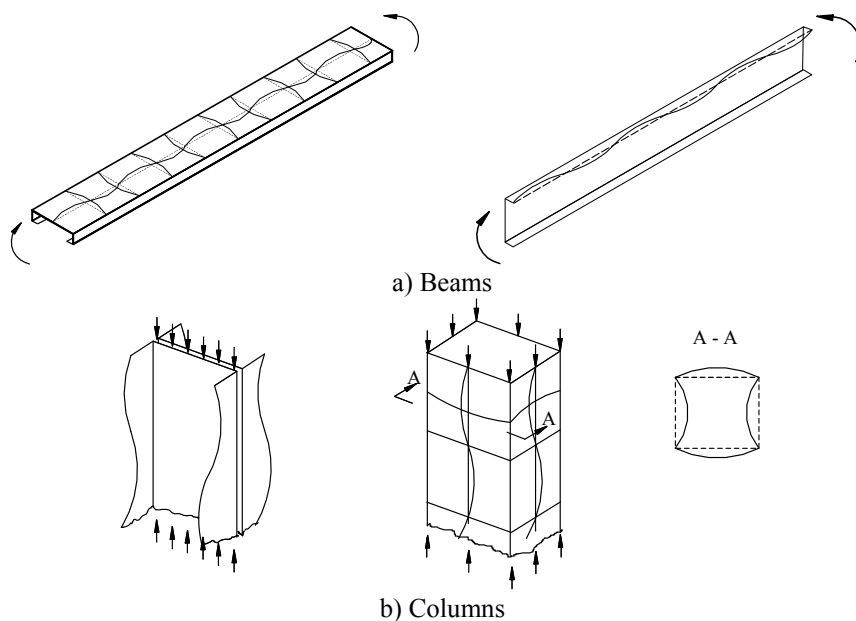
Local buckling of compression walls of cold-formed steel section
